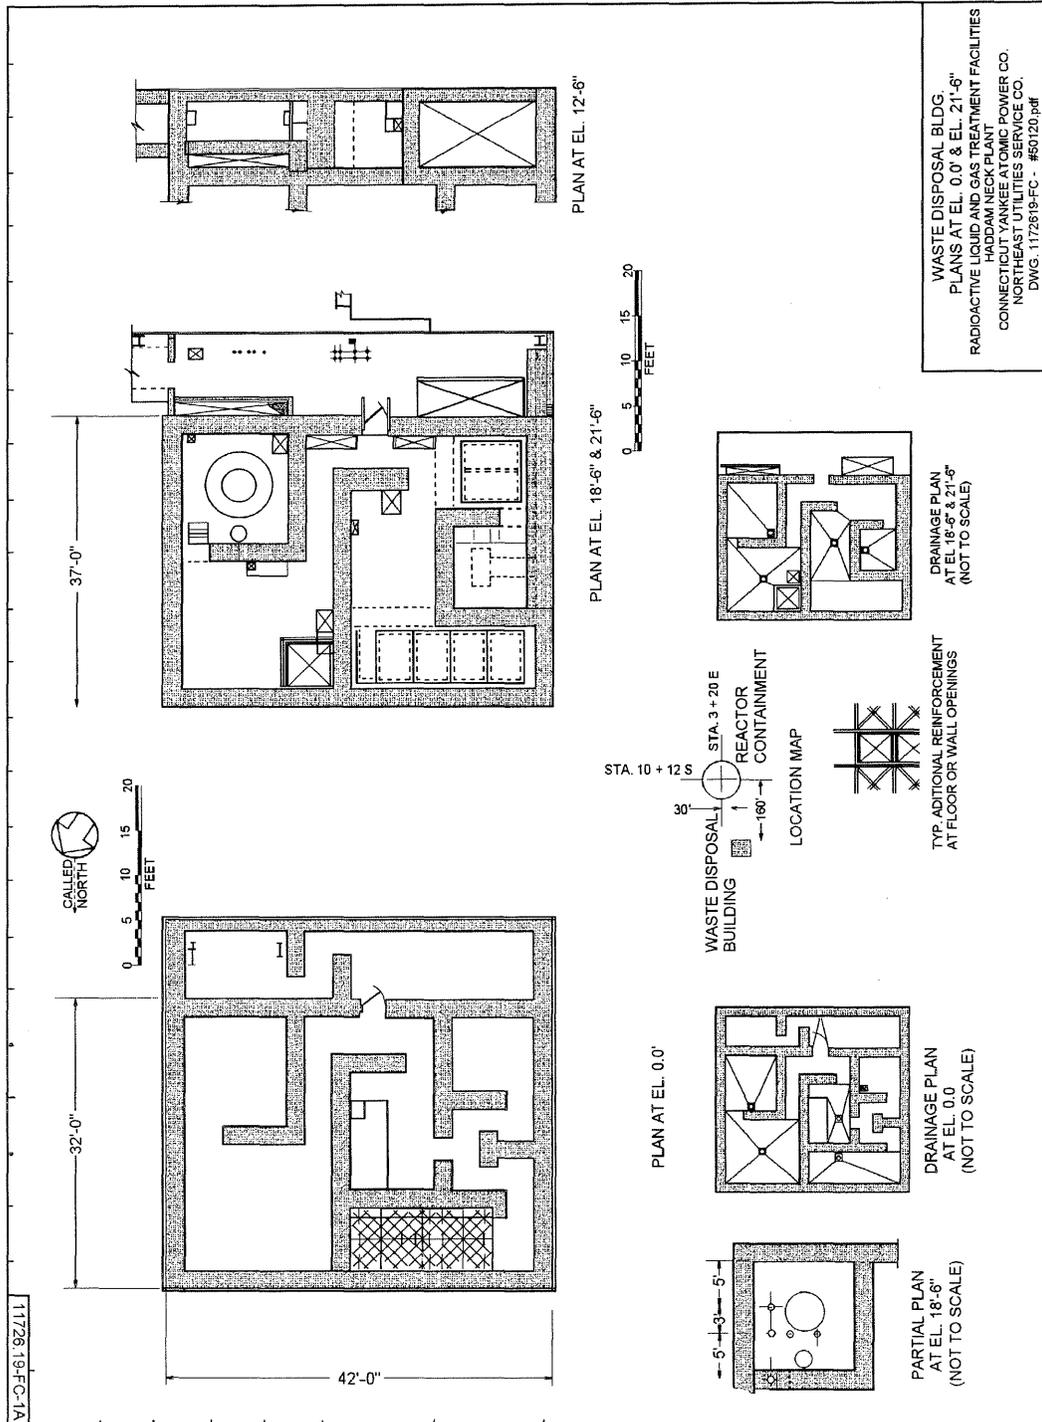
Floor Plans - Liquid Waste Disposal Building
